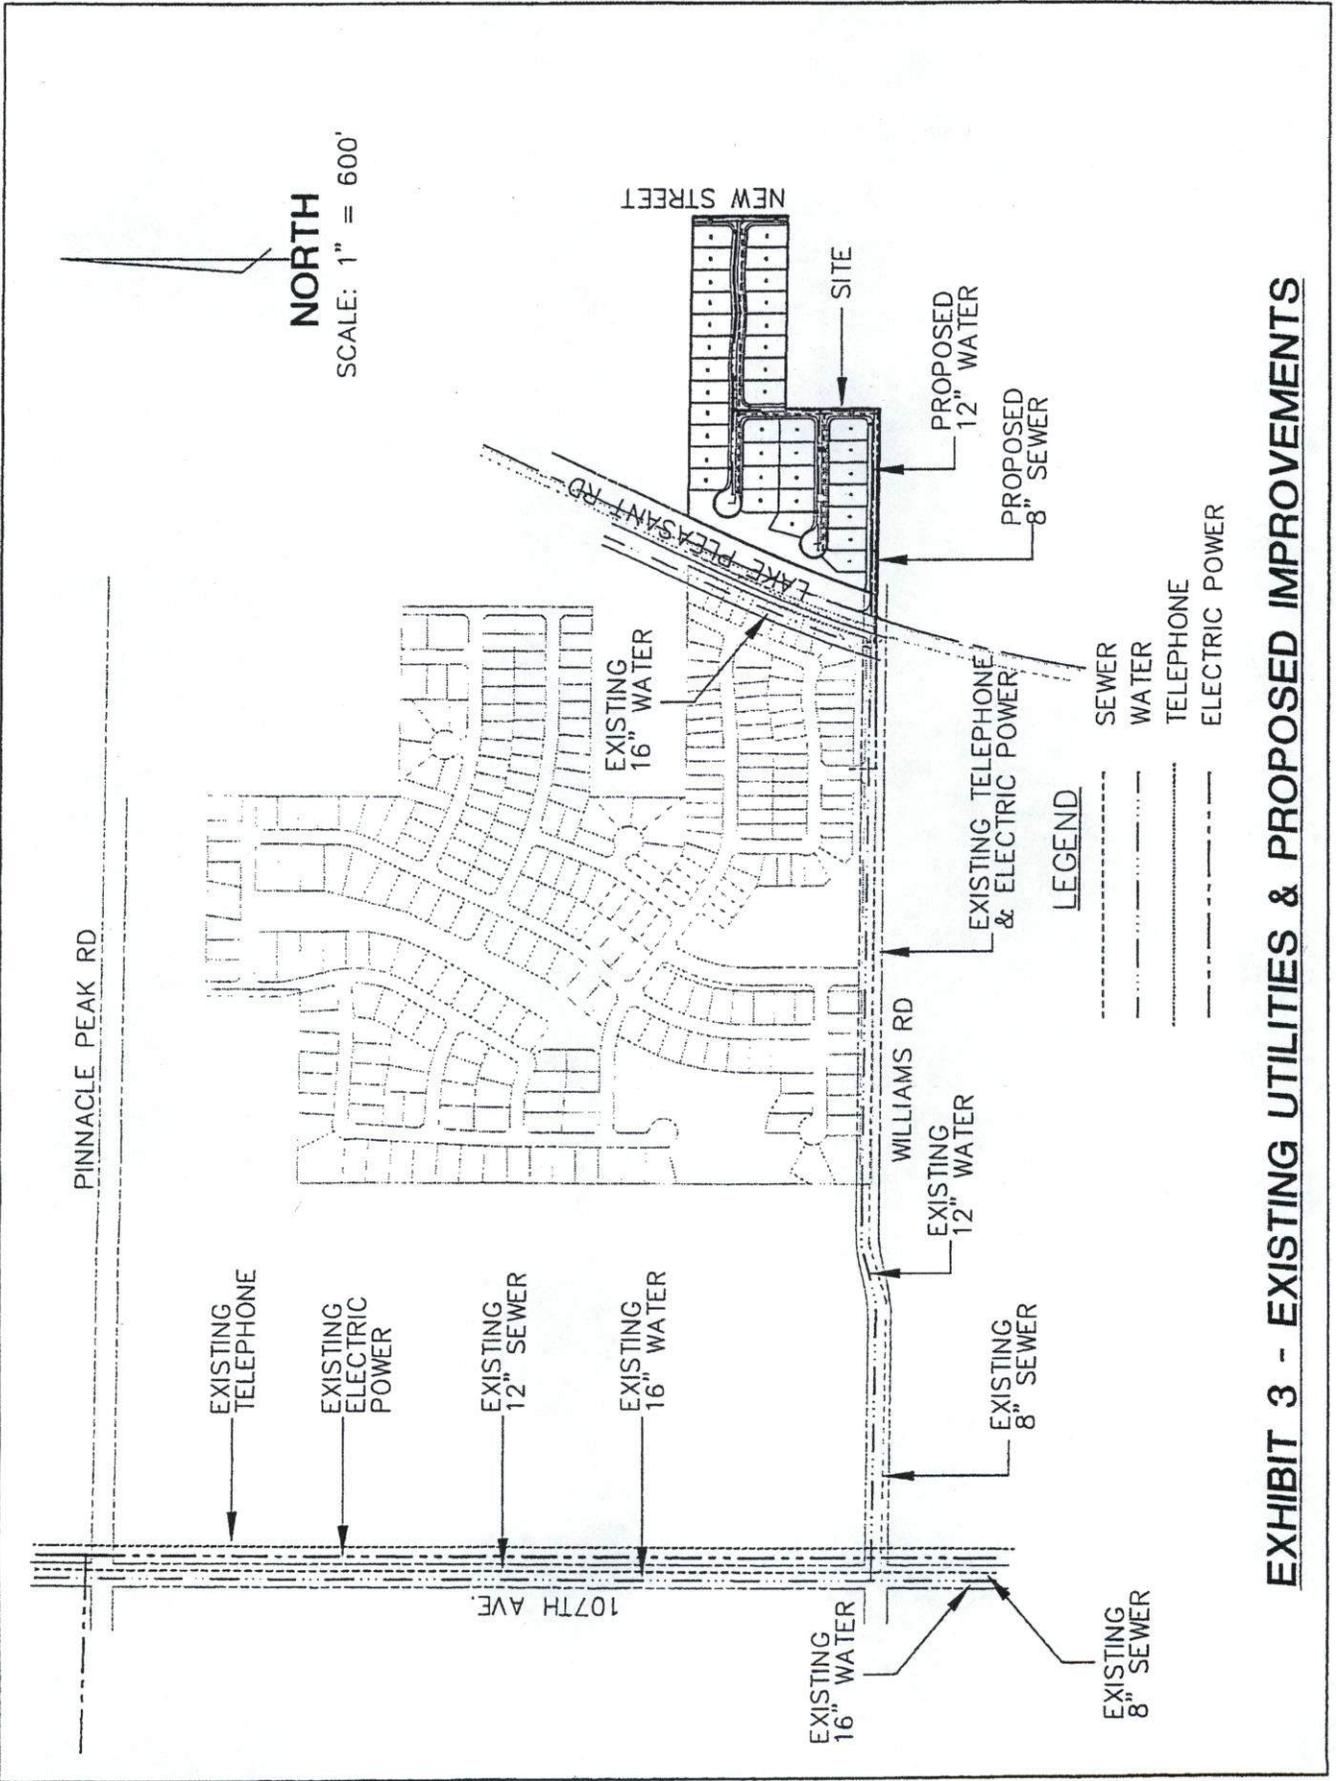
EXISTING UTILITIES & PROPOSED IMPROVEMENTS
